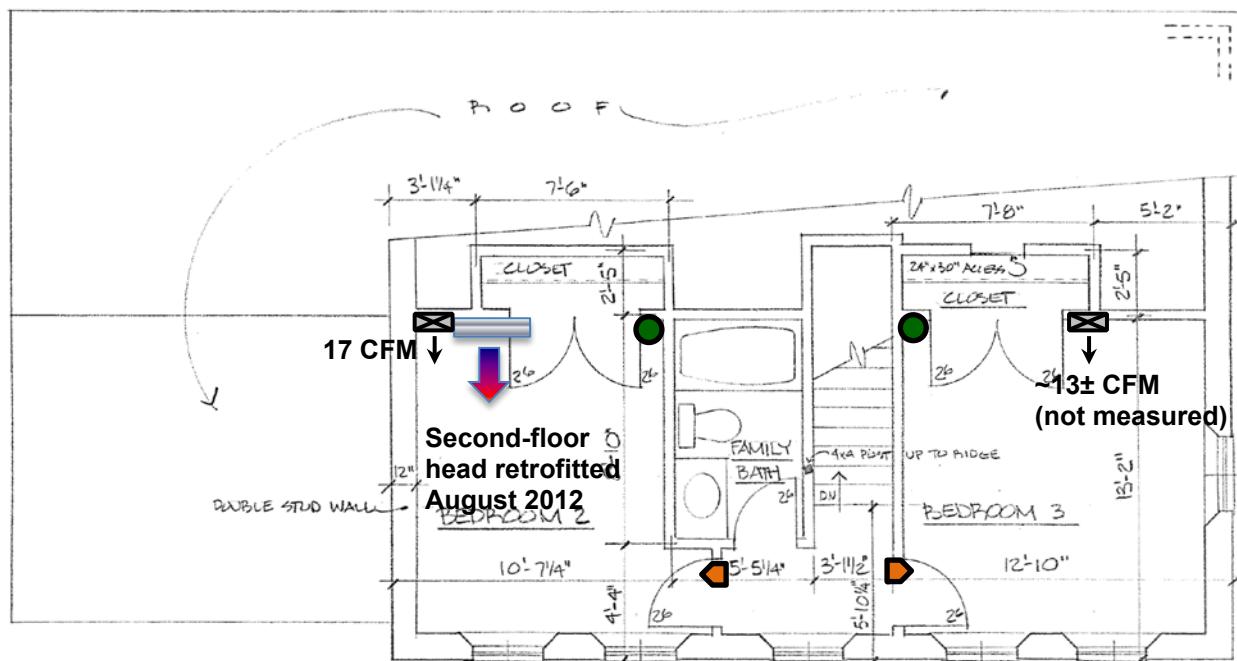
Easthampton Lot 17 second-floor plan, MSHP locations, monitoring locations
